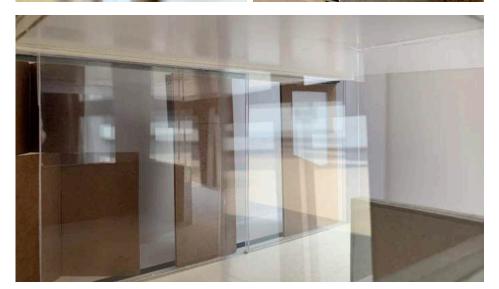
Sliding Glass Wall Details Image 05: Extended Balcony Details
